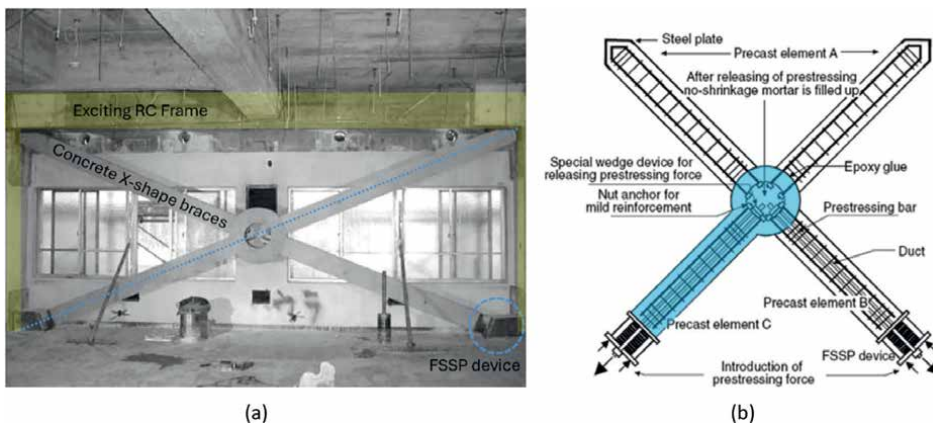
The installation of concrete braces on an existing frame ensures that the openings (windows) remain unobstructed, thereby maintaining the flow of fresh air and light (a). The details and components of the retrofitting system (b), modified from Ref. [26].
